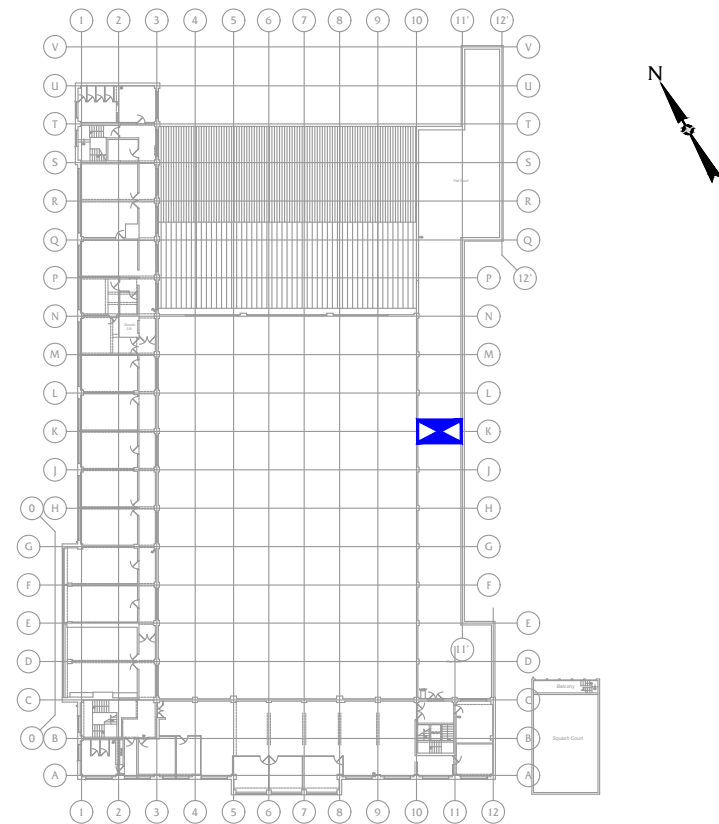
PART REFLECTED 1ST FLOOR SLAB SOFFIT PLAN SHOWING DETAILS OF BEAM AND PRECAST CONCRETE PLANK - SURVEY AREA K/10-11 SCALE 1:10
